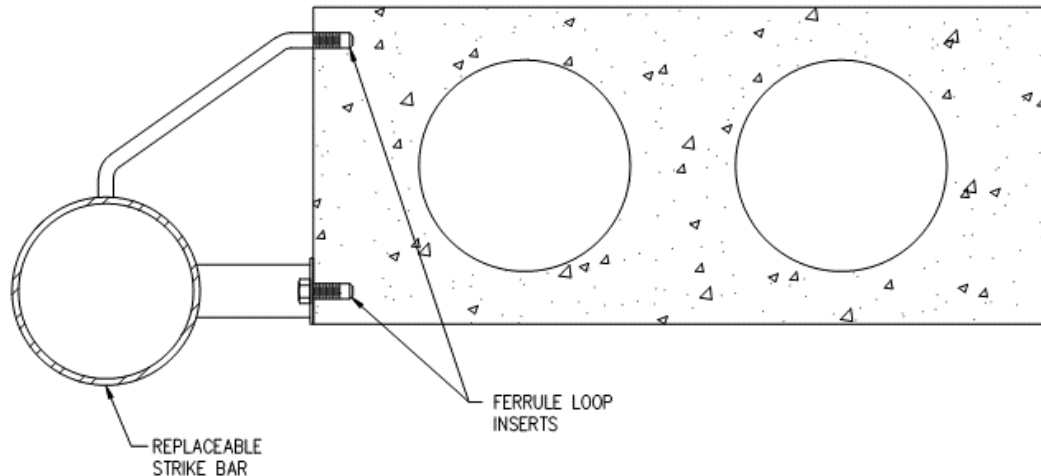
Deck Bulb Tee Replaceable Strike Bar Girder Protection
